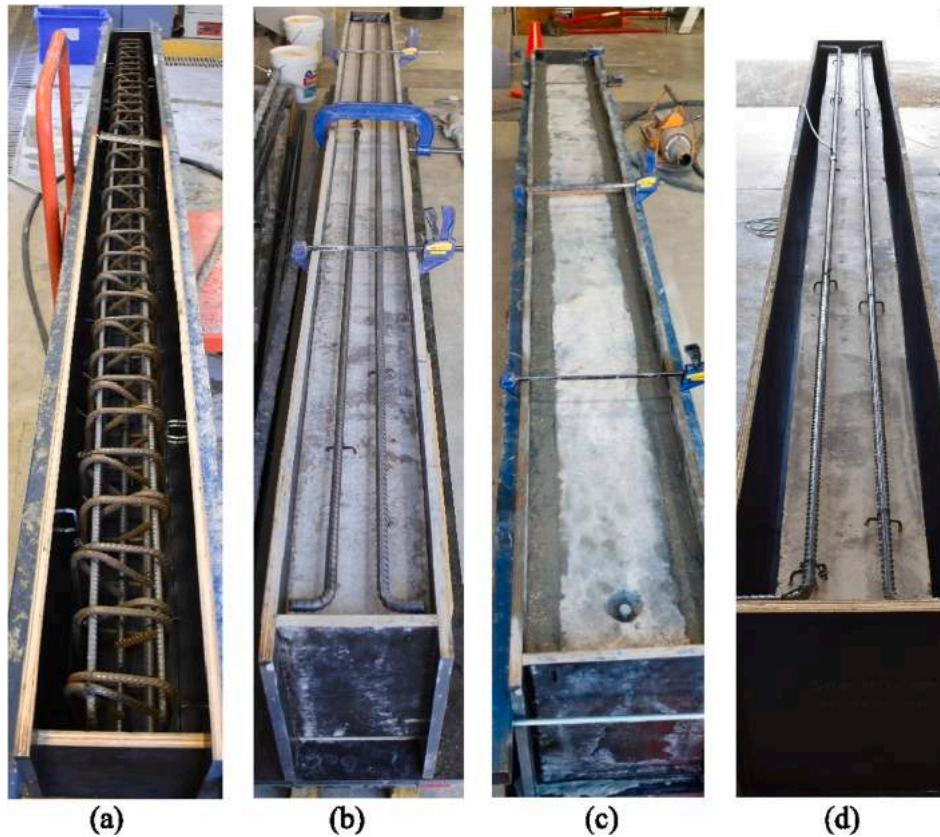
Formwork used for the beam fabrication. (a) CB, (b) SB-1, (c) SB-2, (d) SB-3.
